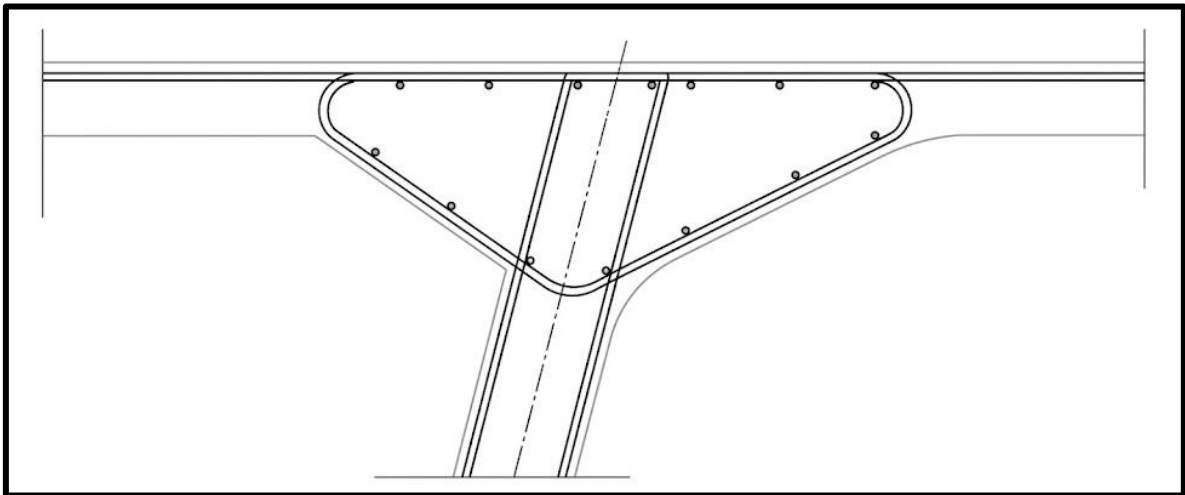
Cross-Section Detail of the upper Haunch at Pier
